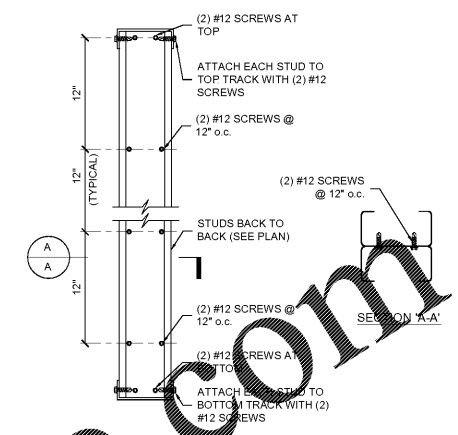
OF WALL PANEL FASTENING PATTERN AT EXTERIOR SHEAR WALL
